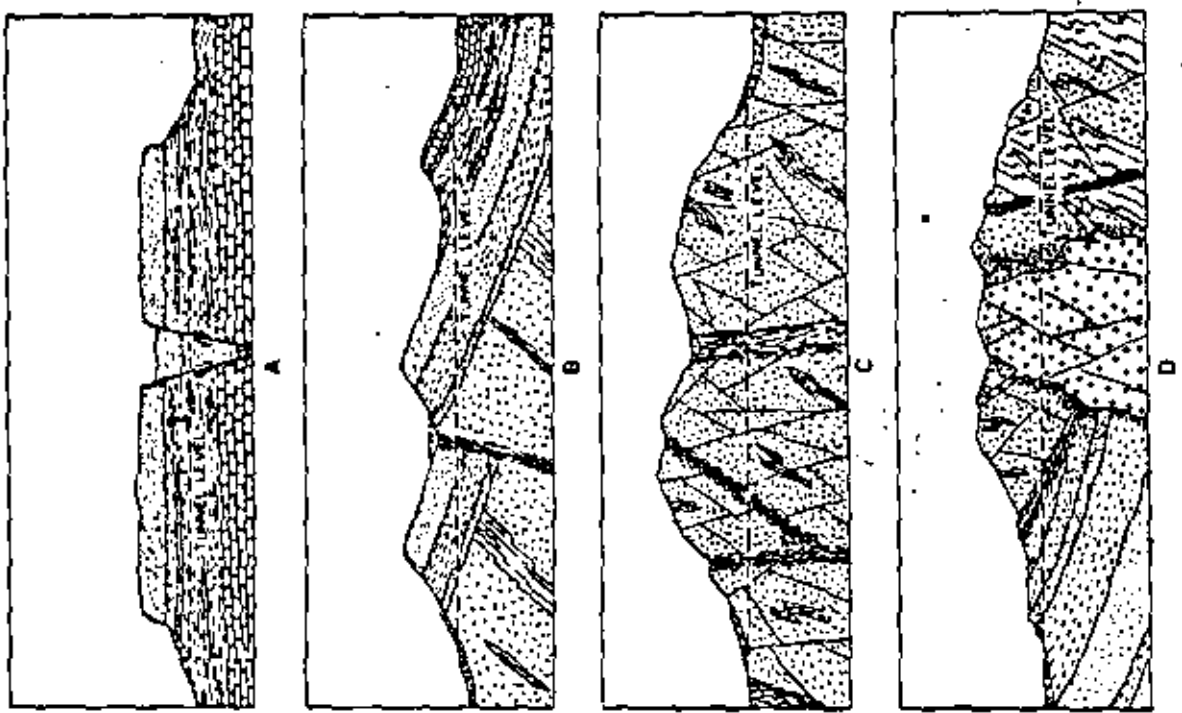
Hypothetical longitudinal cross-sections along alignments of proposed tunnels. See text discussion.
